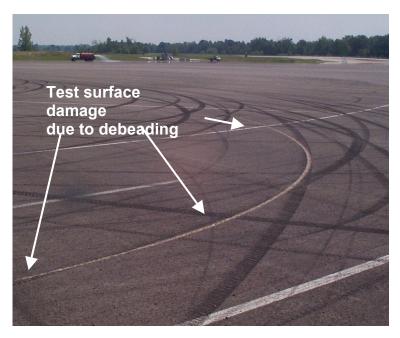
Pavement damage resulting from a left front tire debead during a Fishhook 1a test performed with the Ford Escape.
